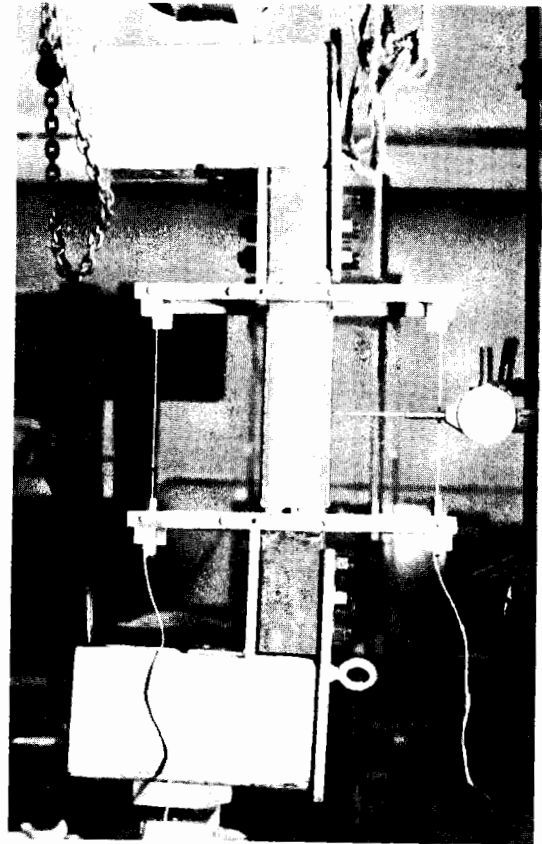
WELD FAILURE IN SPLIT SLEEVE CONNECTION TEST
